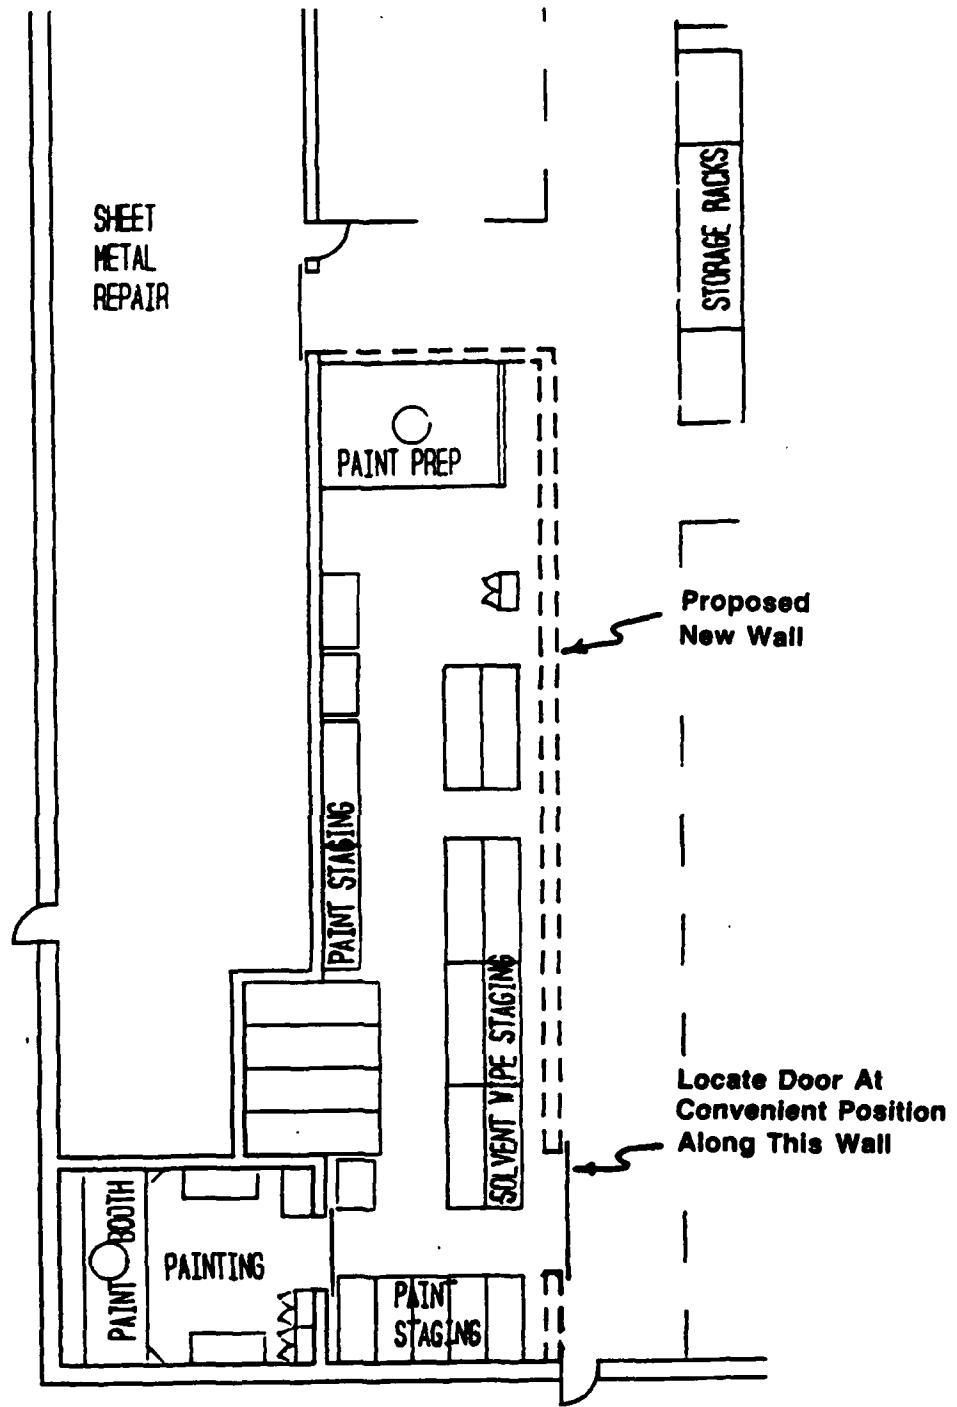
Schematic floor plan of proposed wall to be constructed enclosing the spray painting area of the Main Bay.
